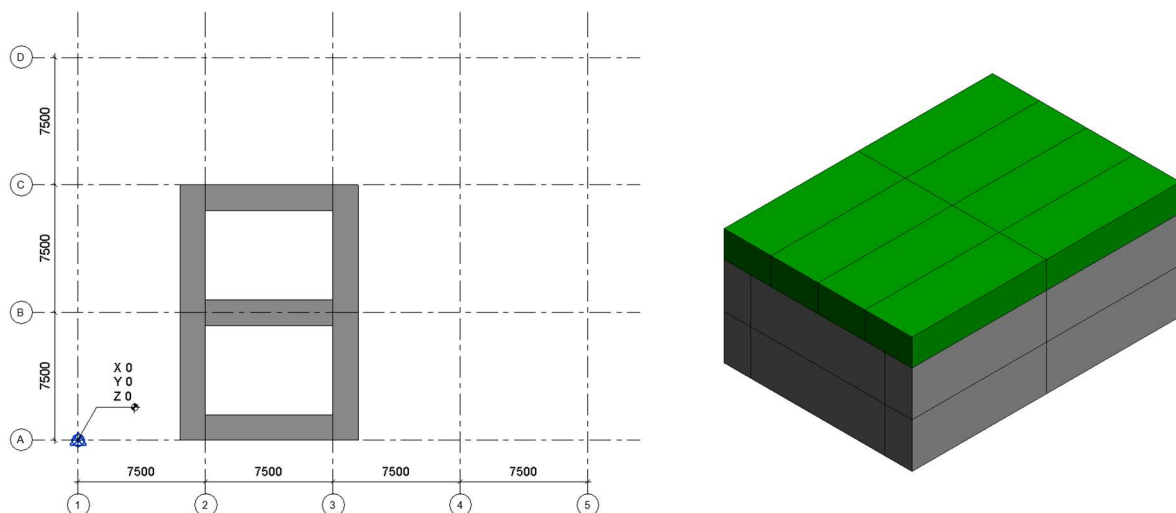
The floor plan of the fictive project (left) and a 3D model of the fictive project (right)
